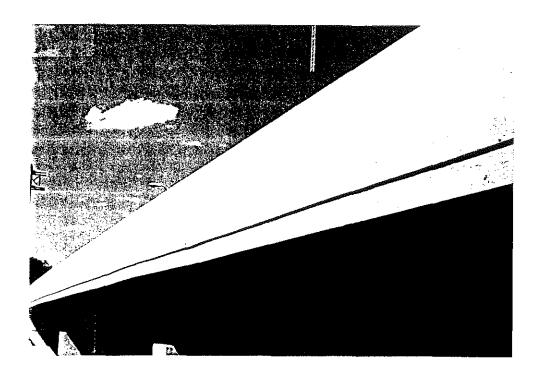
Class S concrete barrier wall contains no shrinkage cracking (west side of Ramp Y over 9th Street).
